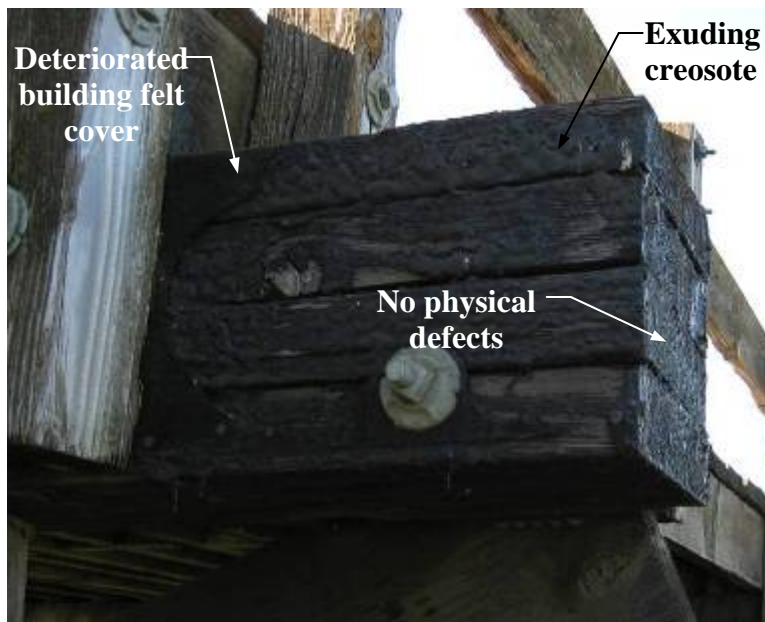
Good individually treated multiple member cap beams allow better seasoning of wood prior to treatment and better penetration
